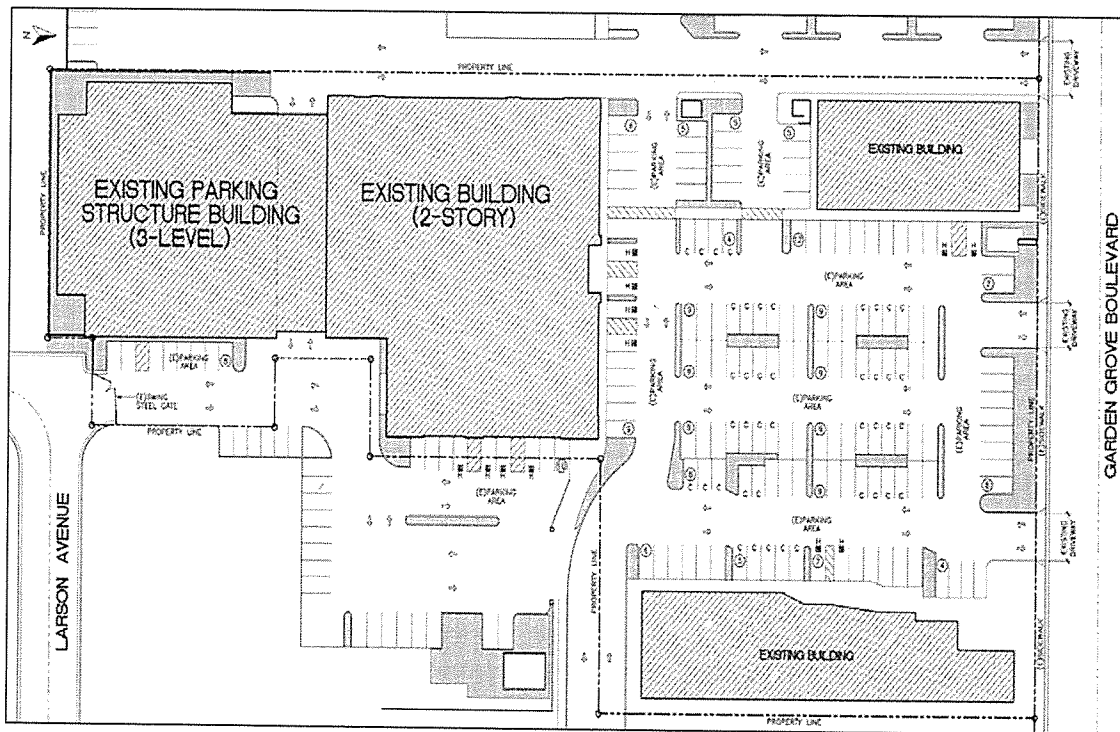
Site Plan of Existing AR Galleria Shopping Center
